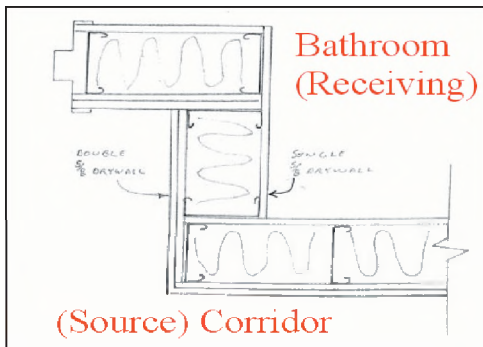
; Detail of Junction between Corridor Test Wall and Side Wall showing Bridging of Wall Cavity by Gypsum Board.
